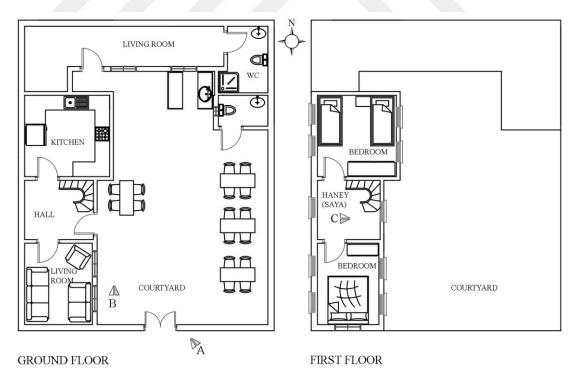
"Kavak Yelleri enterprise" Şengül/Bülent Sülük's house, ground and first floor plans (S.Sevimbige archive, 2017)
